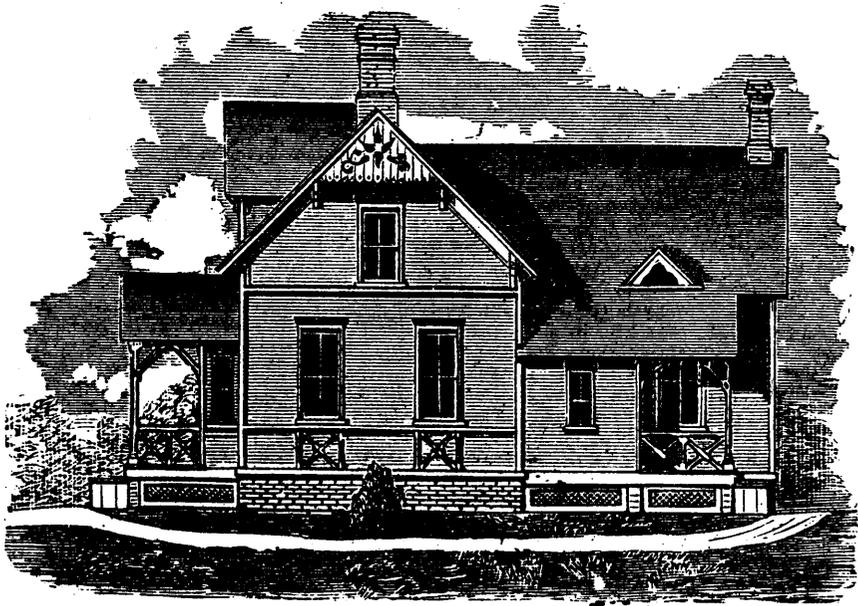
SIDE ELEVATION OF THE HOUSE.
